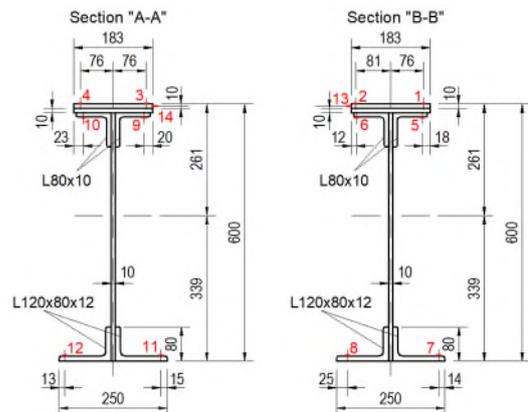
Sections of the longitudinal girders and points of placement of the strain sensors
